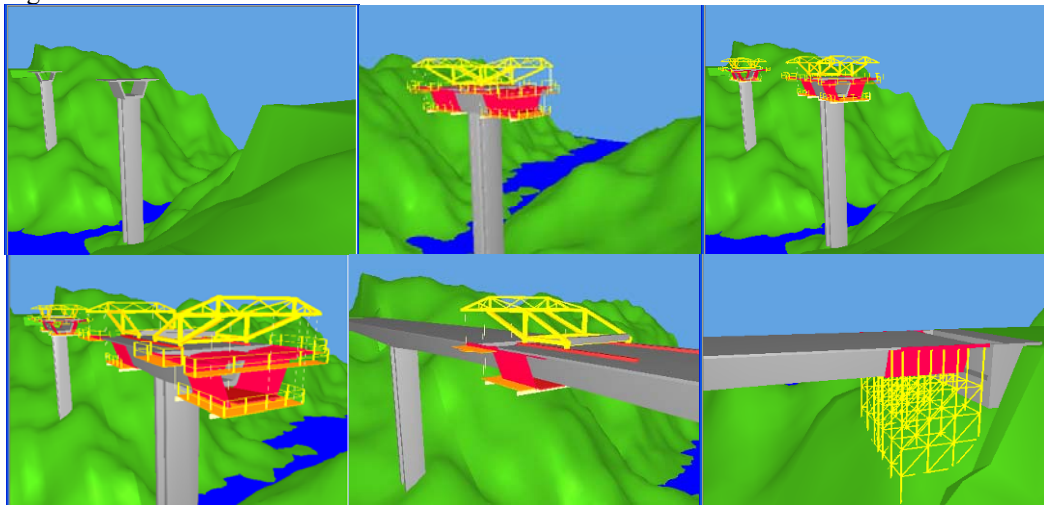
Placing the initial pillars, movement of the advanced equipment and concreting above the false work near the abutment
